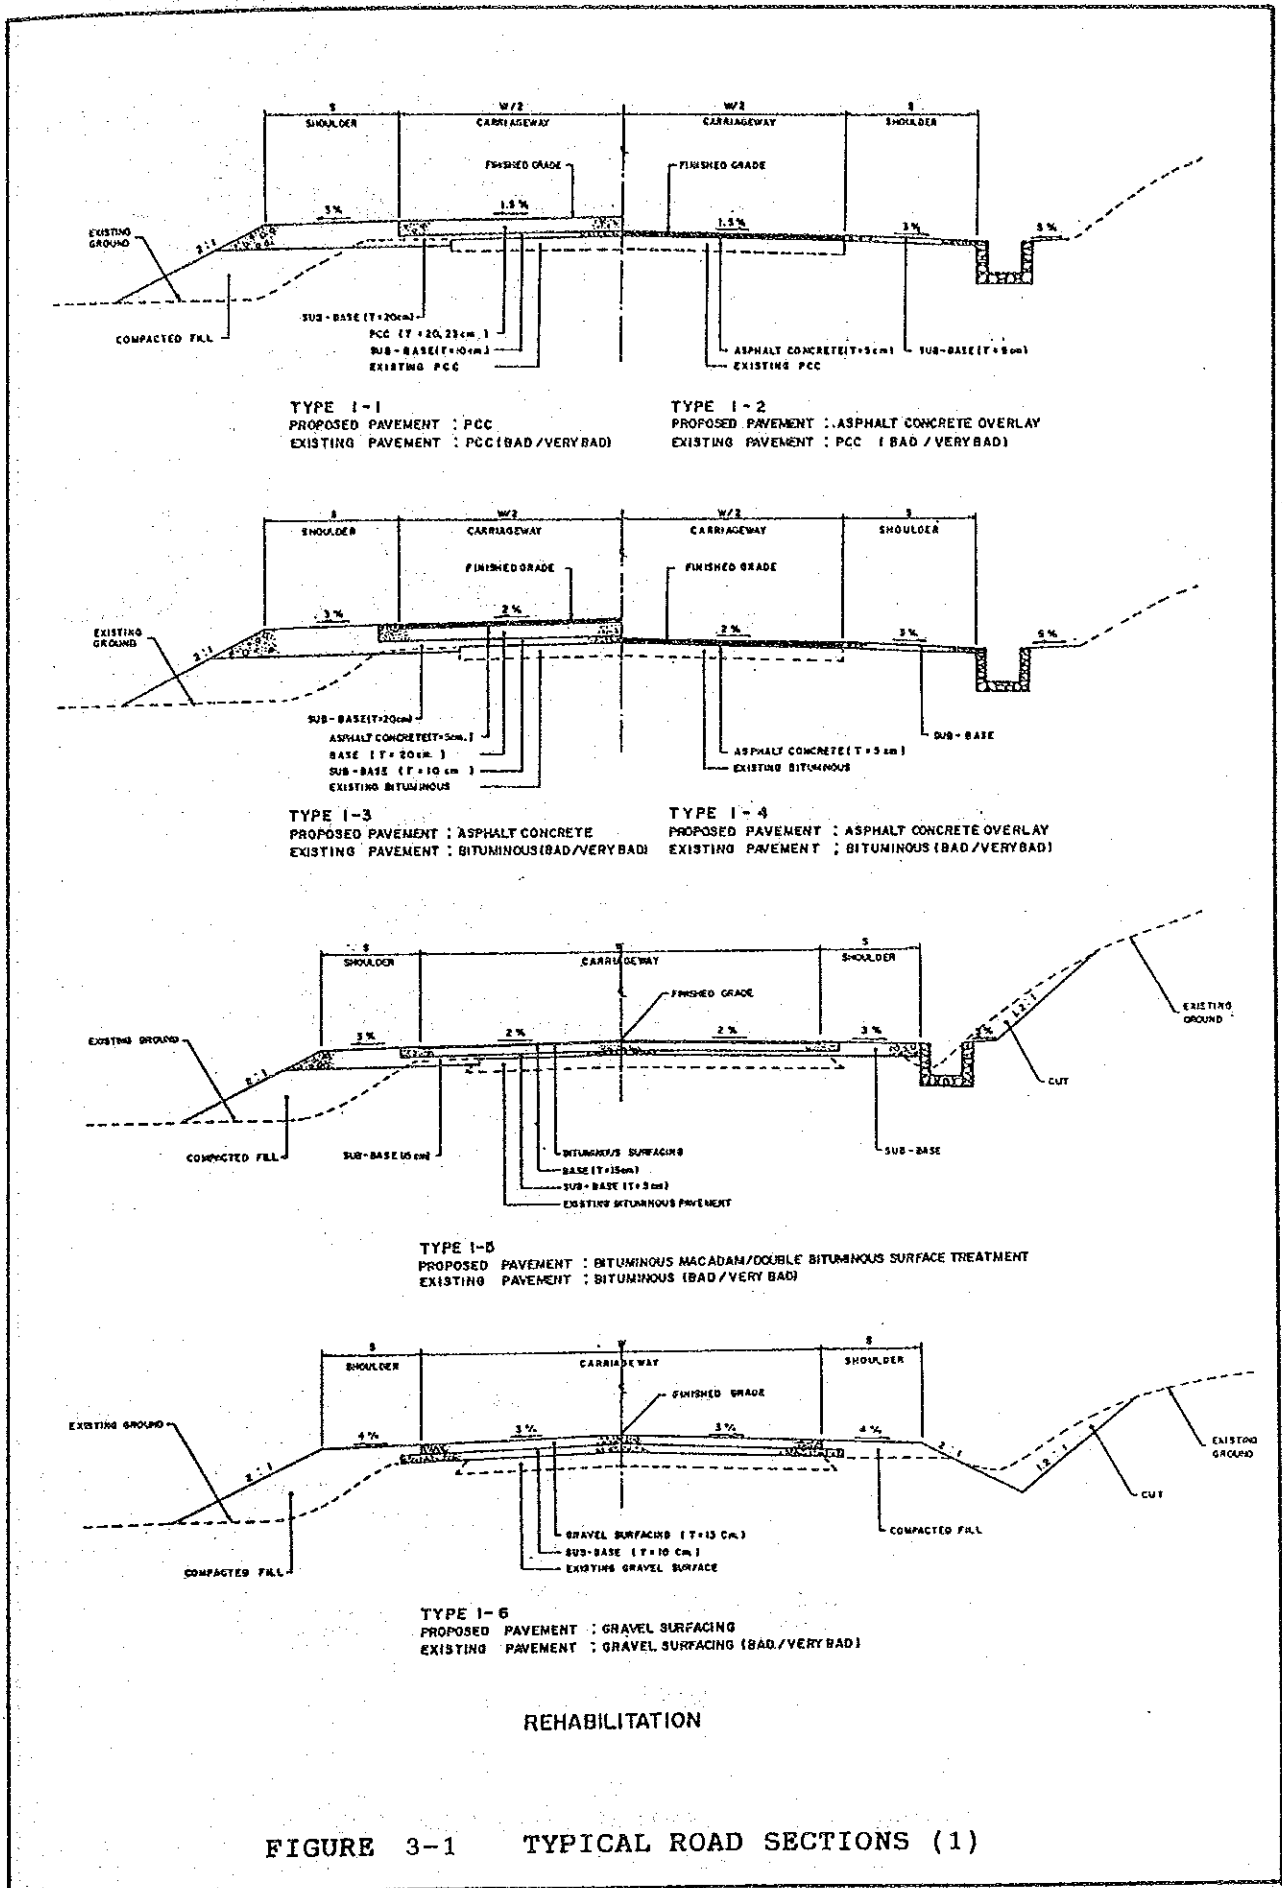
TYPICAL ROAD SECTIONS (1)
